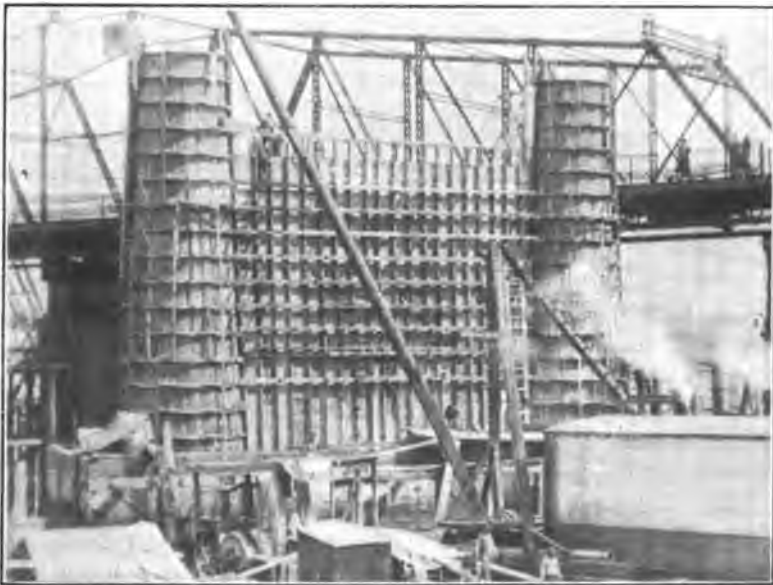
FORMS ON ELEVENTH STREET BRIDGE PIERS, TACOMA.
